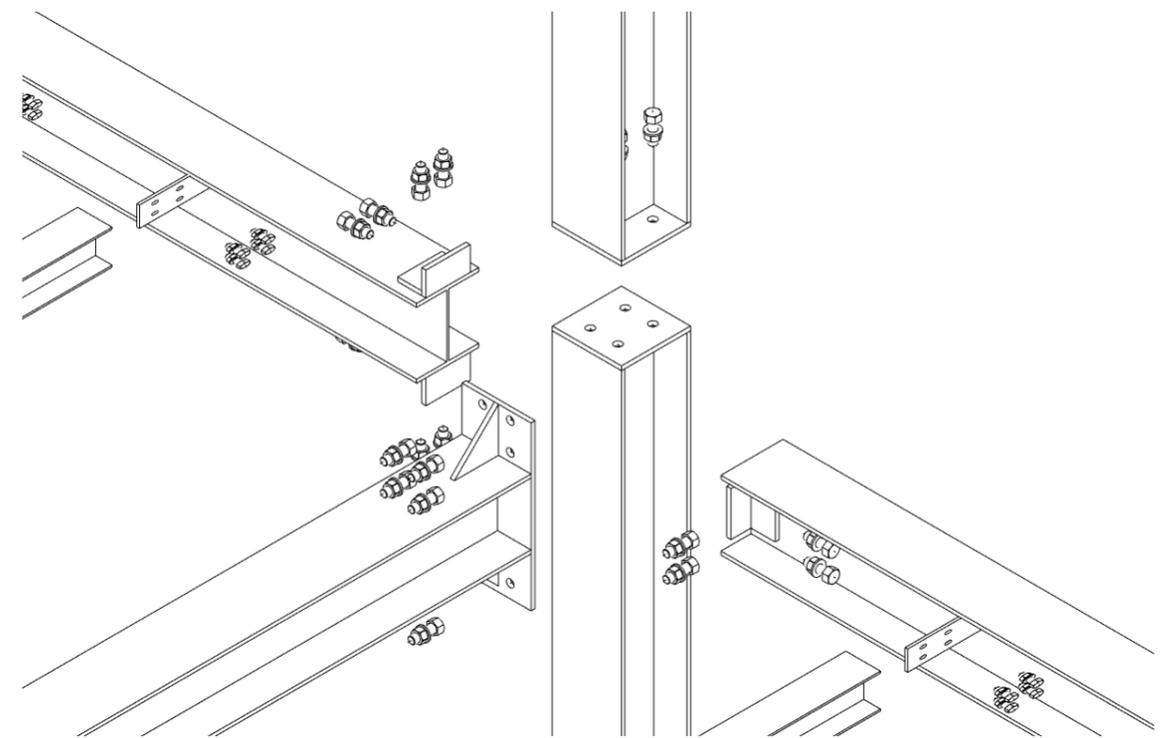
Prototype 3 — Block typology: steel connection disassembled
